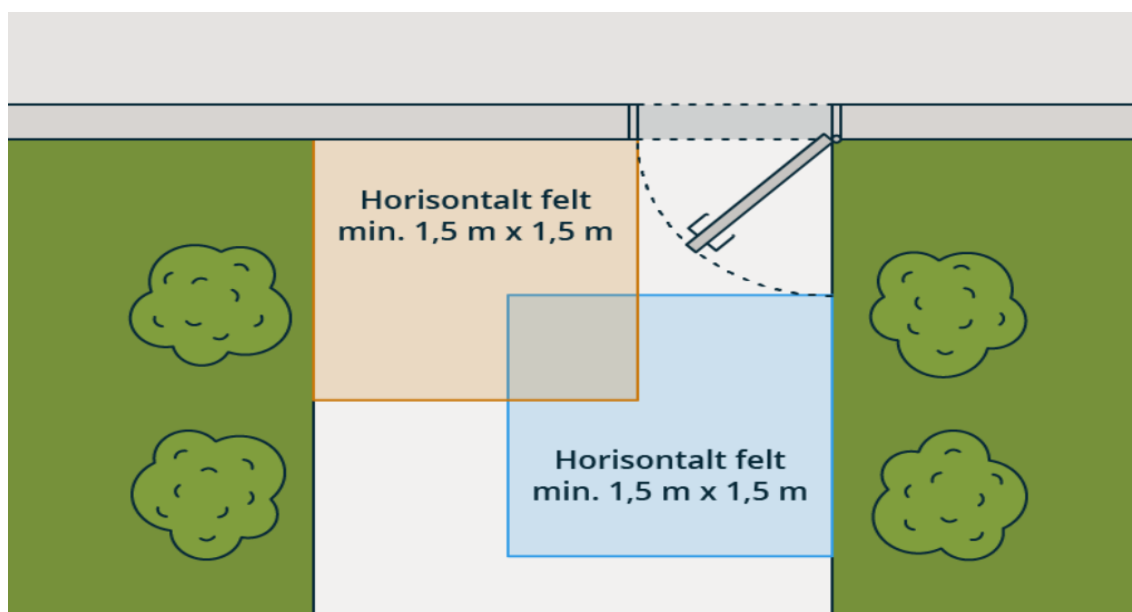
Horizontal field of main entrance doors [Source: TEK 17, Section 14,4]
